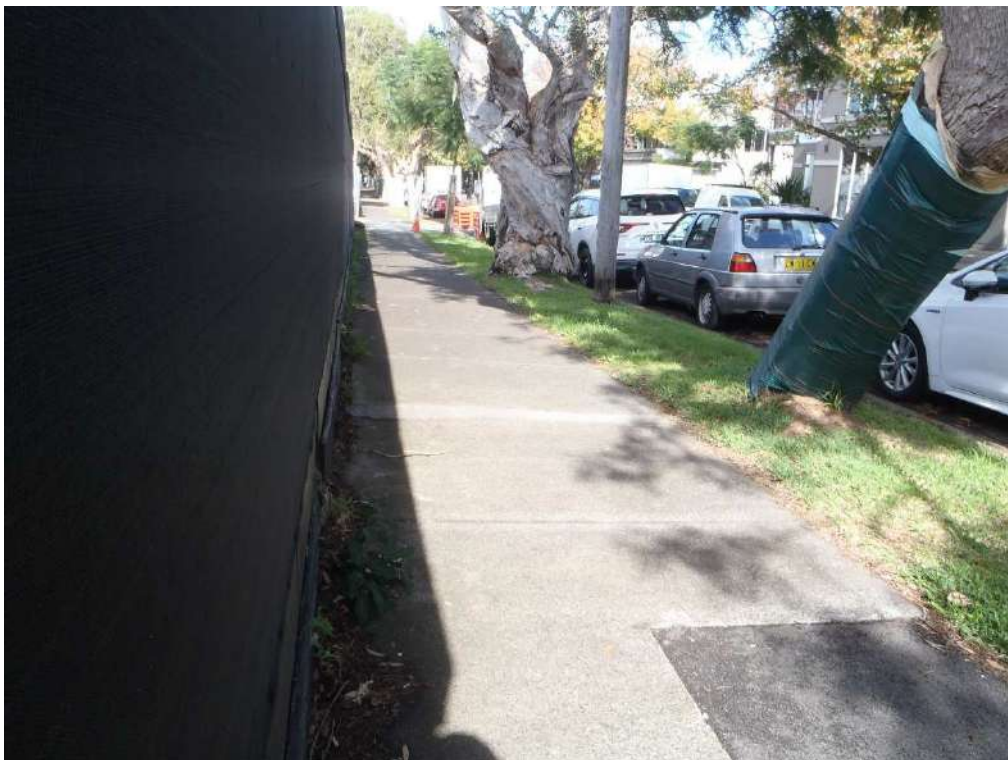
Both photos above: T80a Jacaranda (foreground) and T81 Paperbark on the street verge of Young St. The site is on the left. Note: the canopy does not extend into the site. Also note there used to be a building on the site in this location (now demolished).
